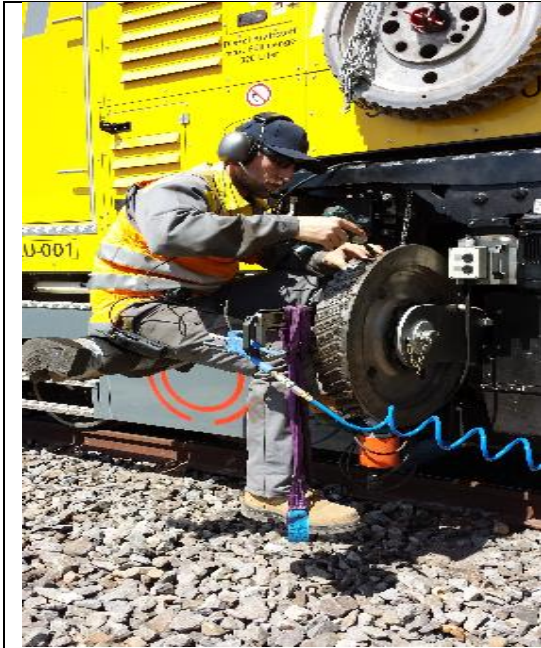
Rail milling: spark free rotational cutting process of a milling wheel (equipped with hard metal cutting inserts) resulting in generation of milling chips.
